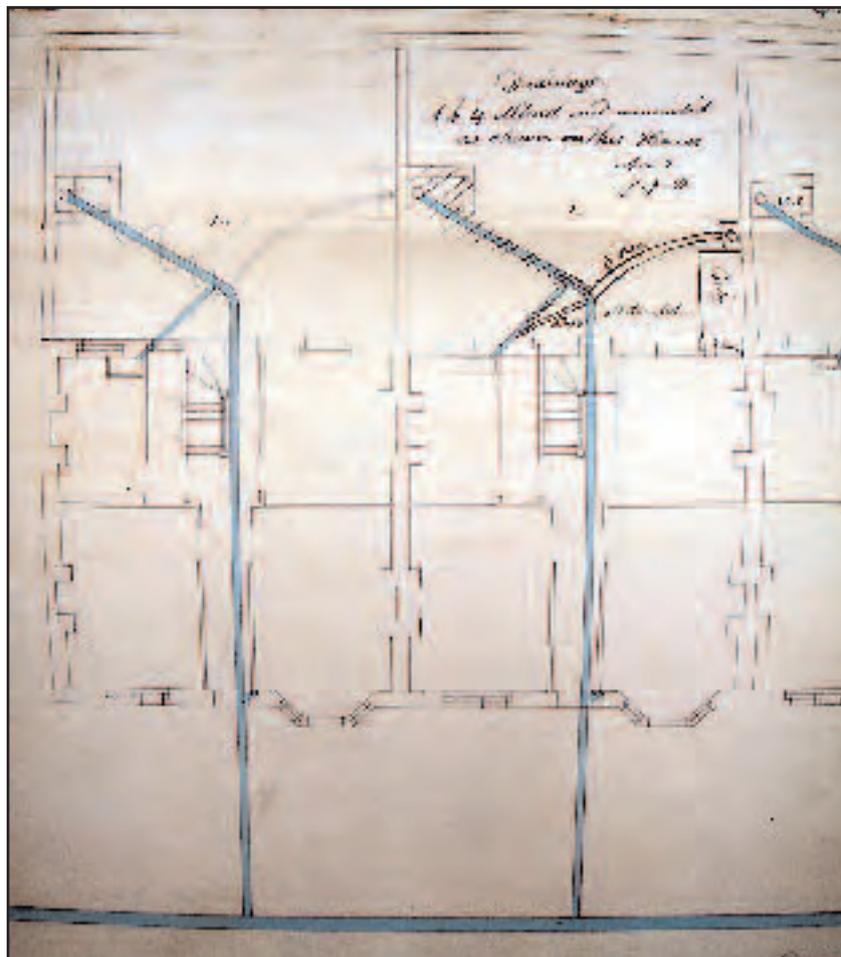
Ground floor plan design for 21-25 St Michael's Park, 1873
